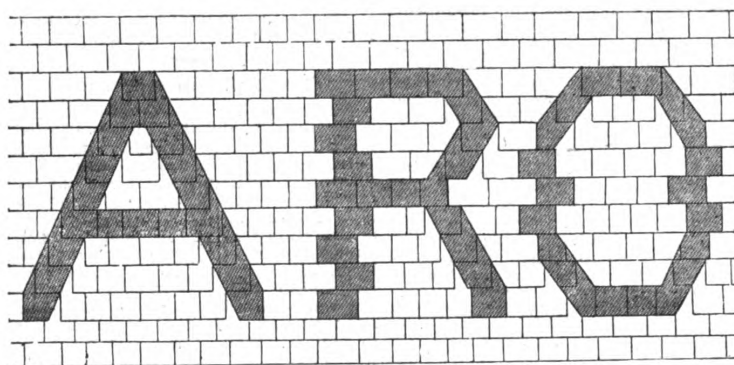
Showing how Letters of the Alphabet may be Formed with Slate Specially Cut for the Purpose.
